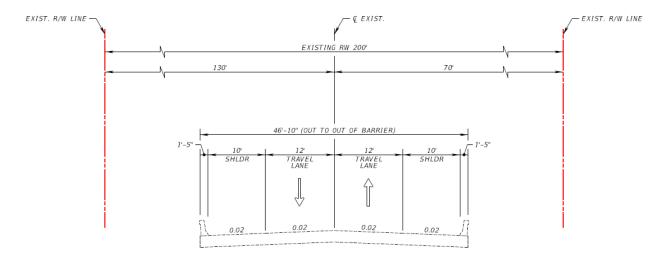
Existing Typical Section – Bridge Over Turnbull Creek
